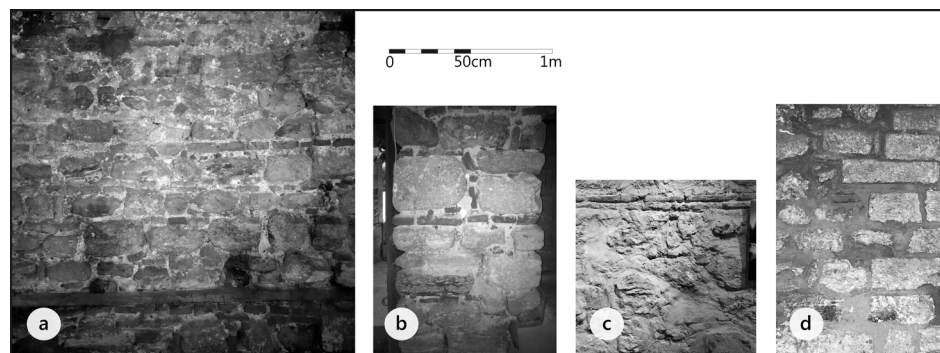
9a and 9b. Masonry techniques of Space “A”; 9c. Masonry techniques from first floor rooms, eg. door no 7, with stone and bricks; 9d. Masonry from first floor north arcade (Çinaryılmaz, 2019).
